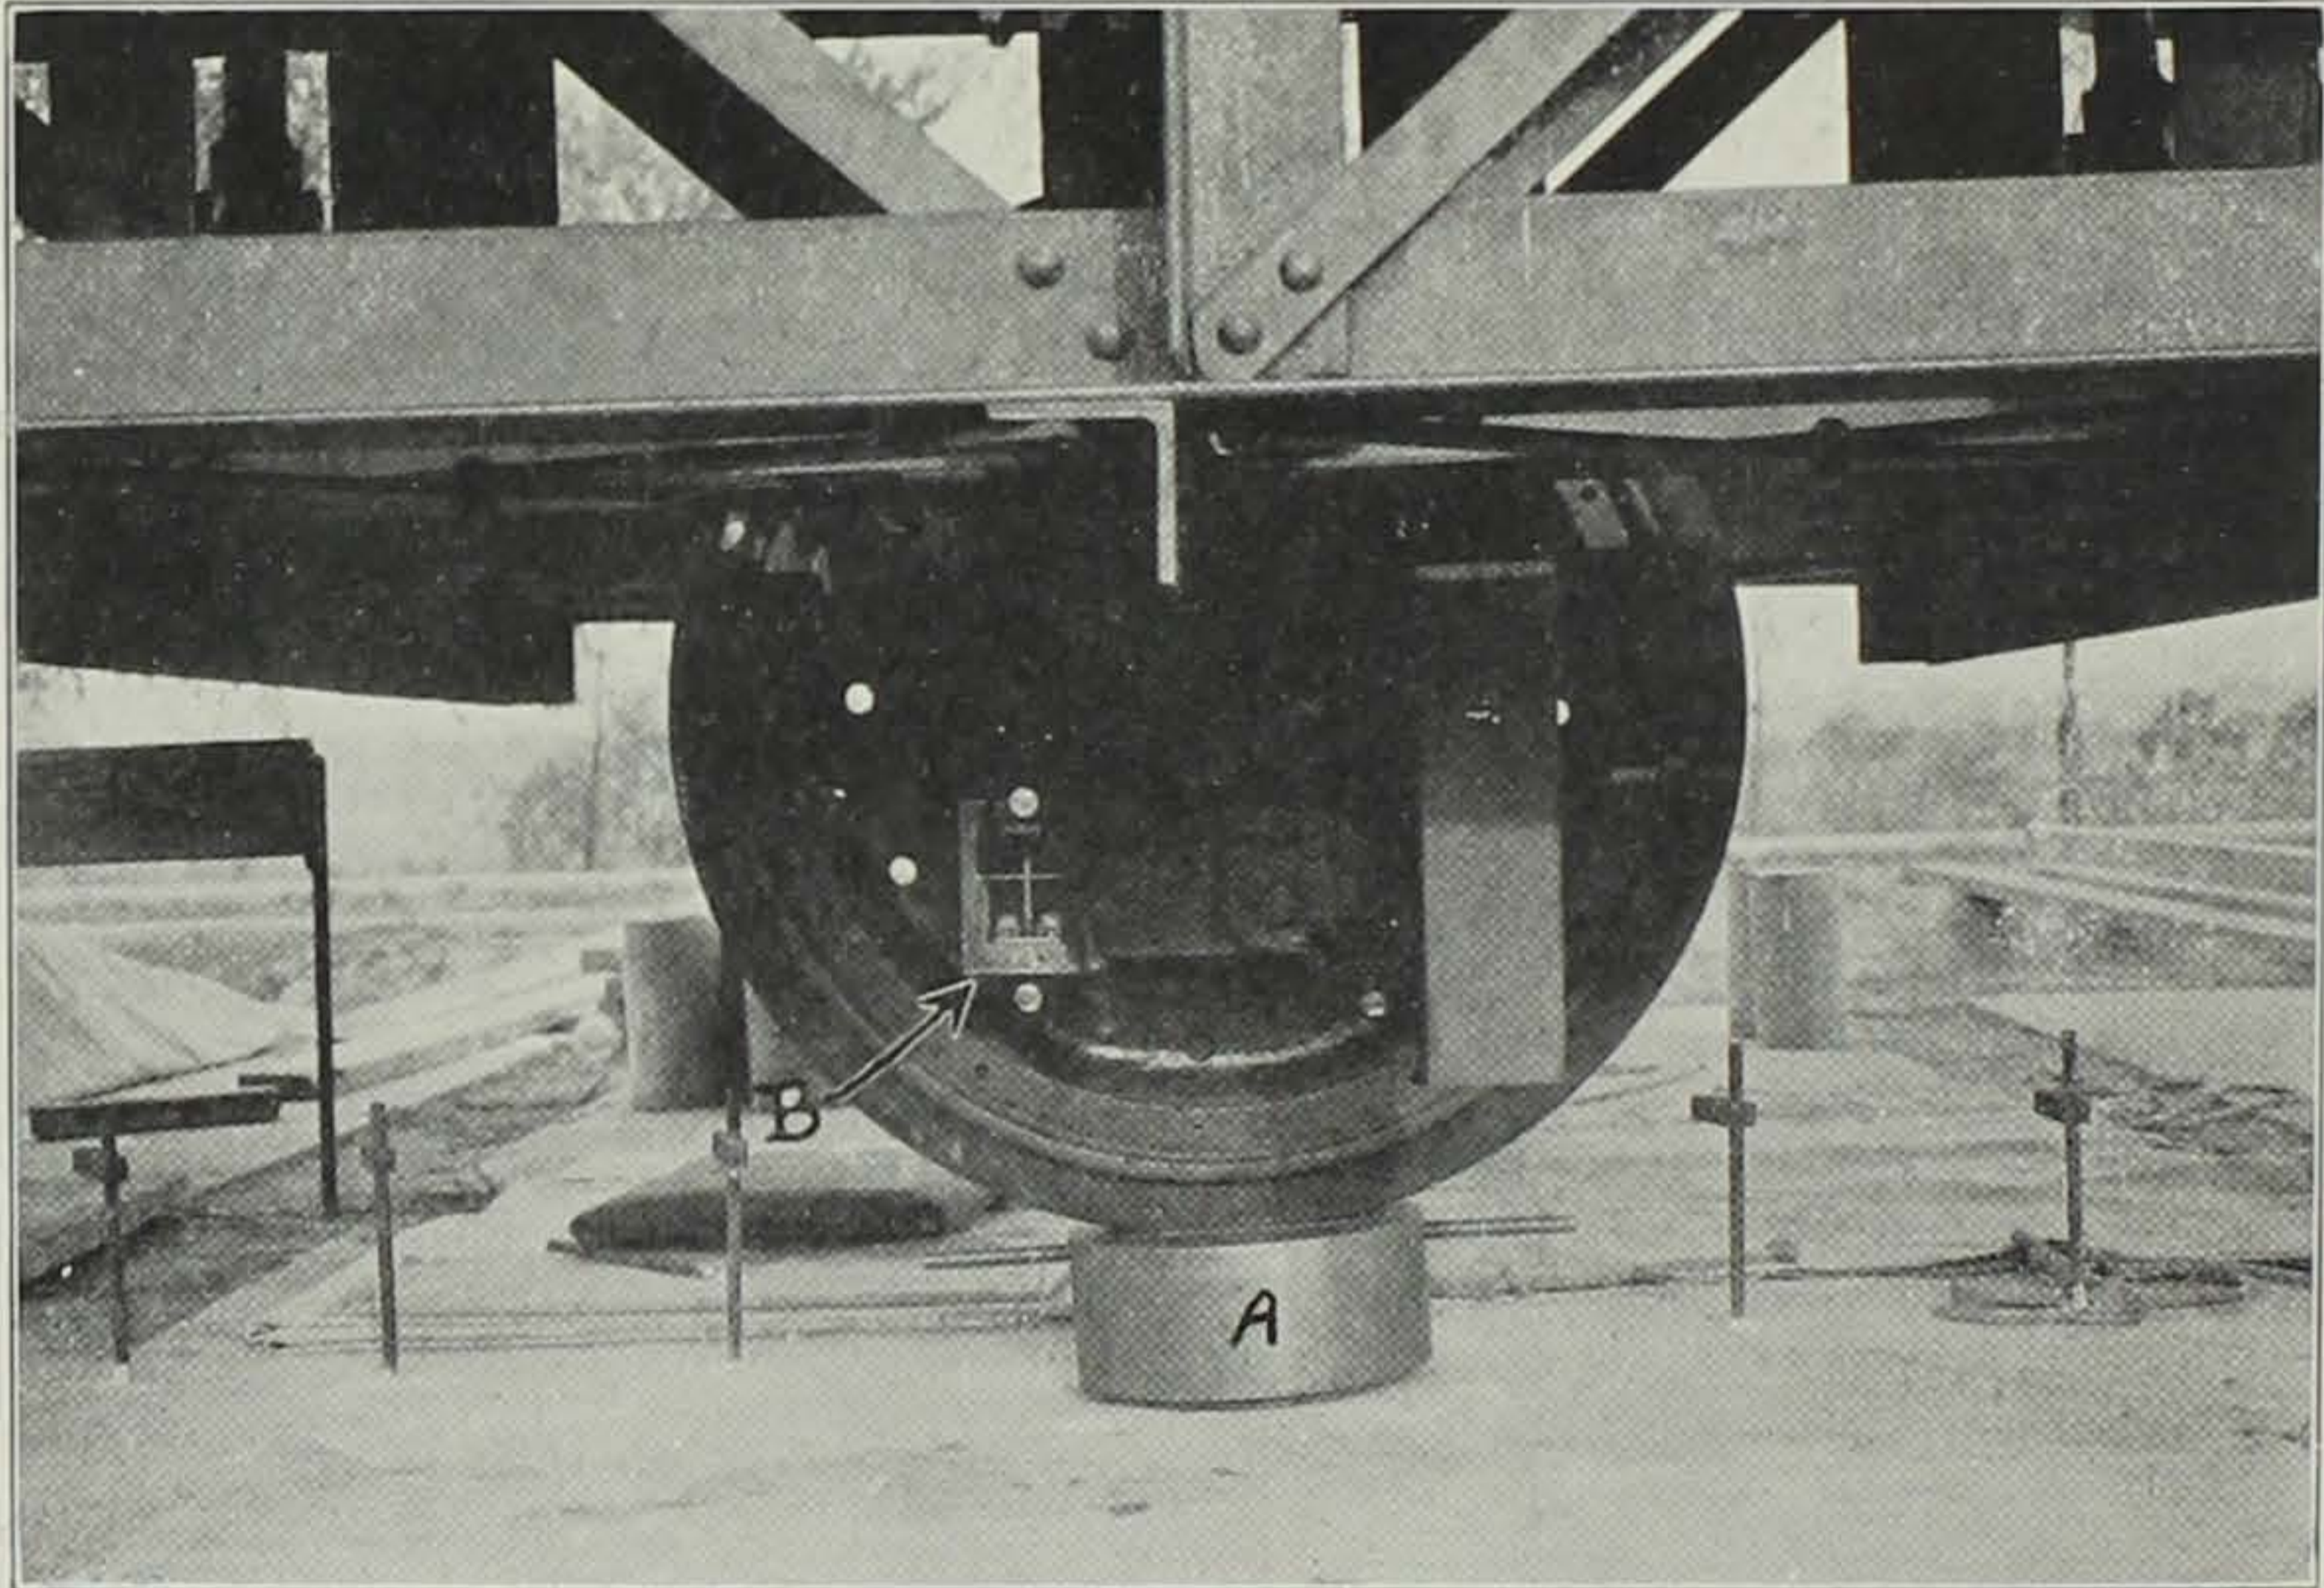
MEASURING IMPACTS BY THE KREUGER METHOD
